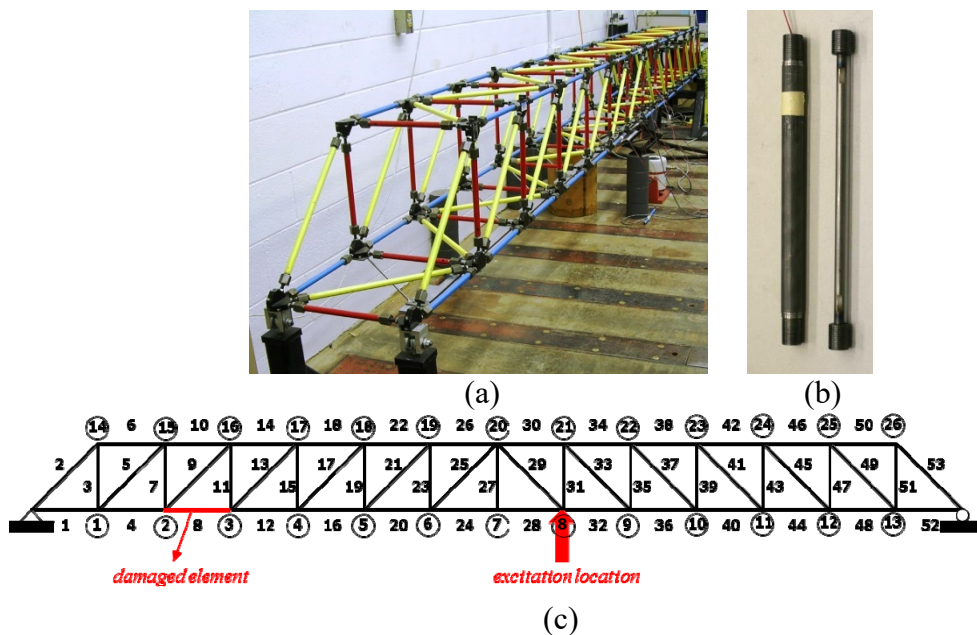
the 14-bay truss structure (Gao & Spencer, 2008): (a) truss structure, (b) truss elements, (c) sensor locations.
